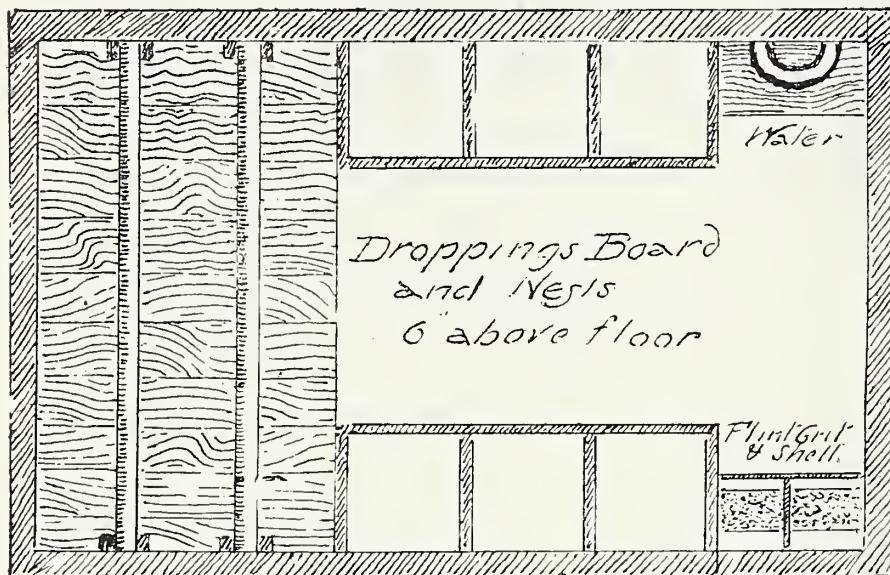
Ground Plan of Field House for Twenty Fowls.
